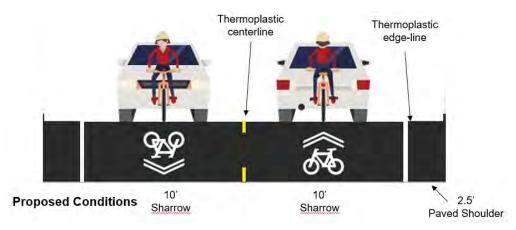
Proposed Cross Section at View Avenue and Ocean Avenue
